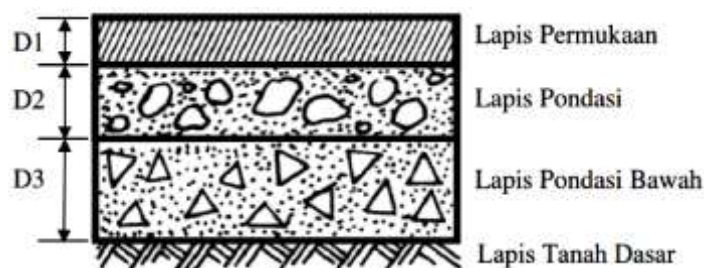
Flexible pavement layer arrangement (Anonymous, 1987)
